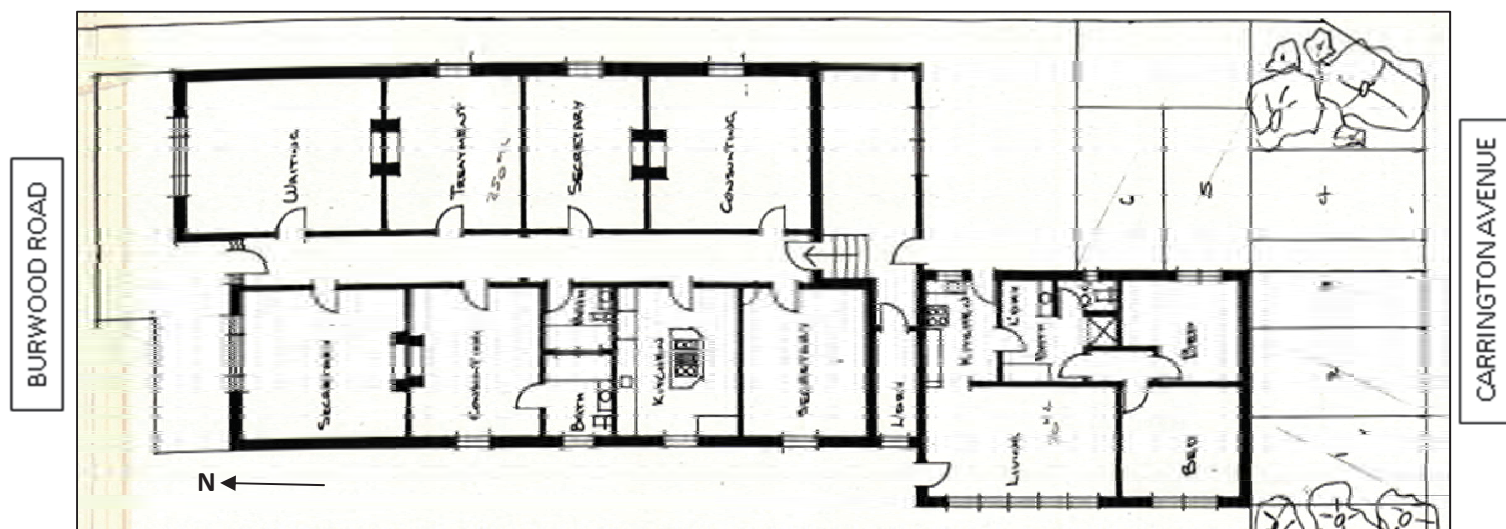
Endorsed plan associated with Planning Permit No. 2446 (dated 17 November 1987).
